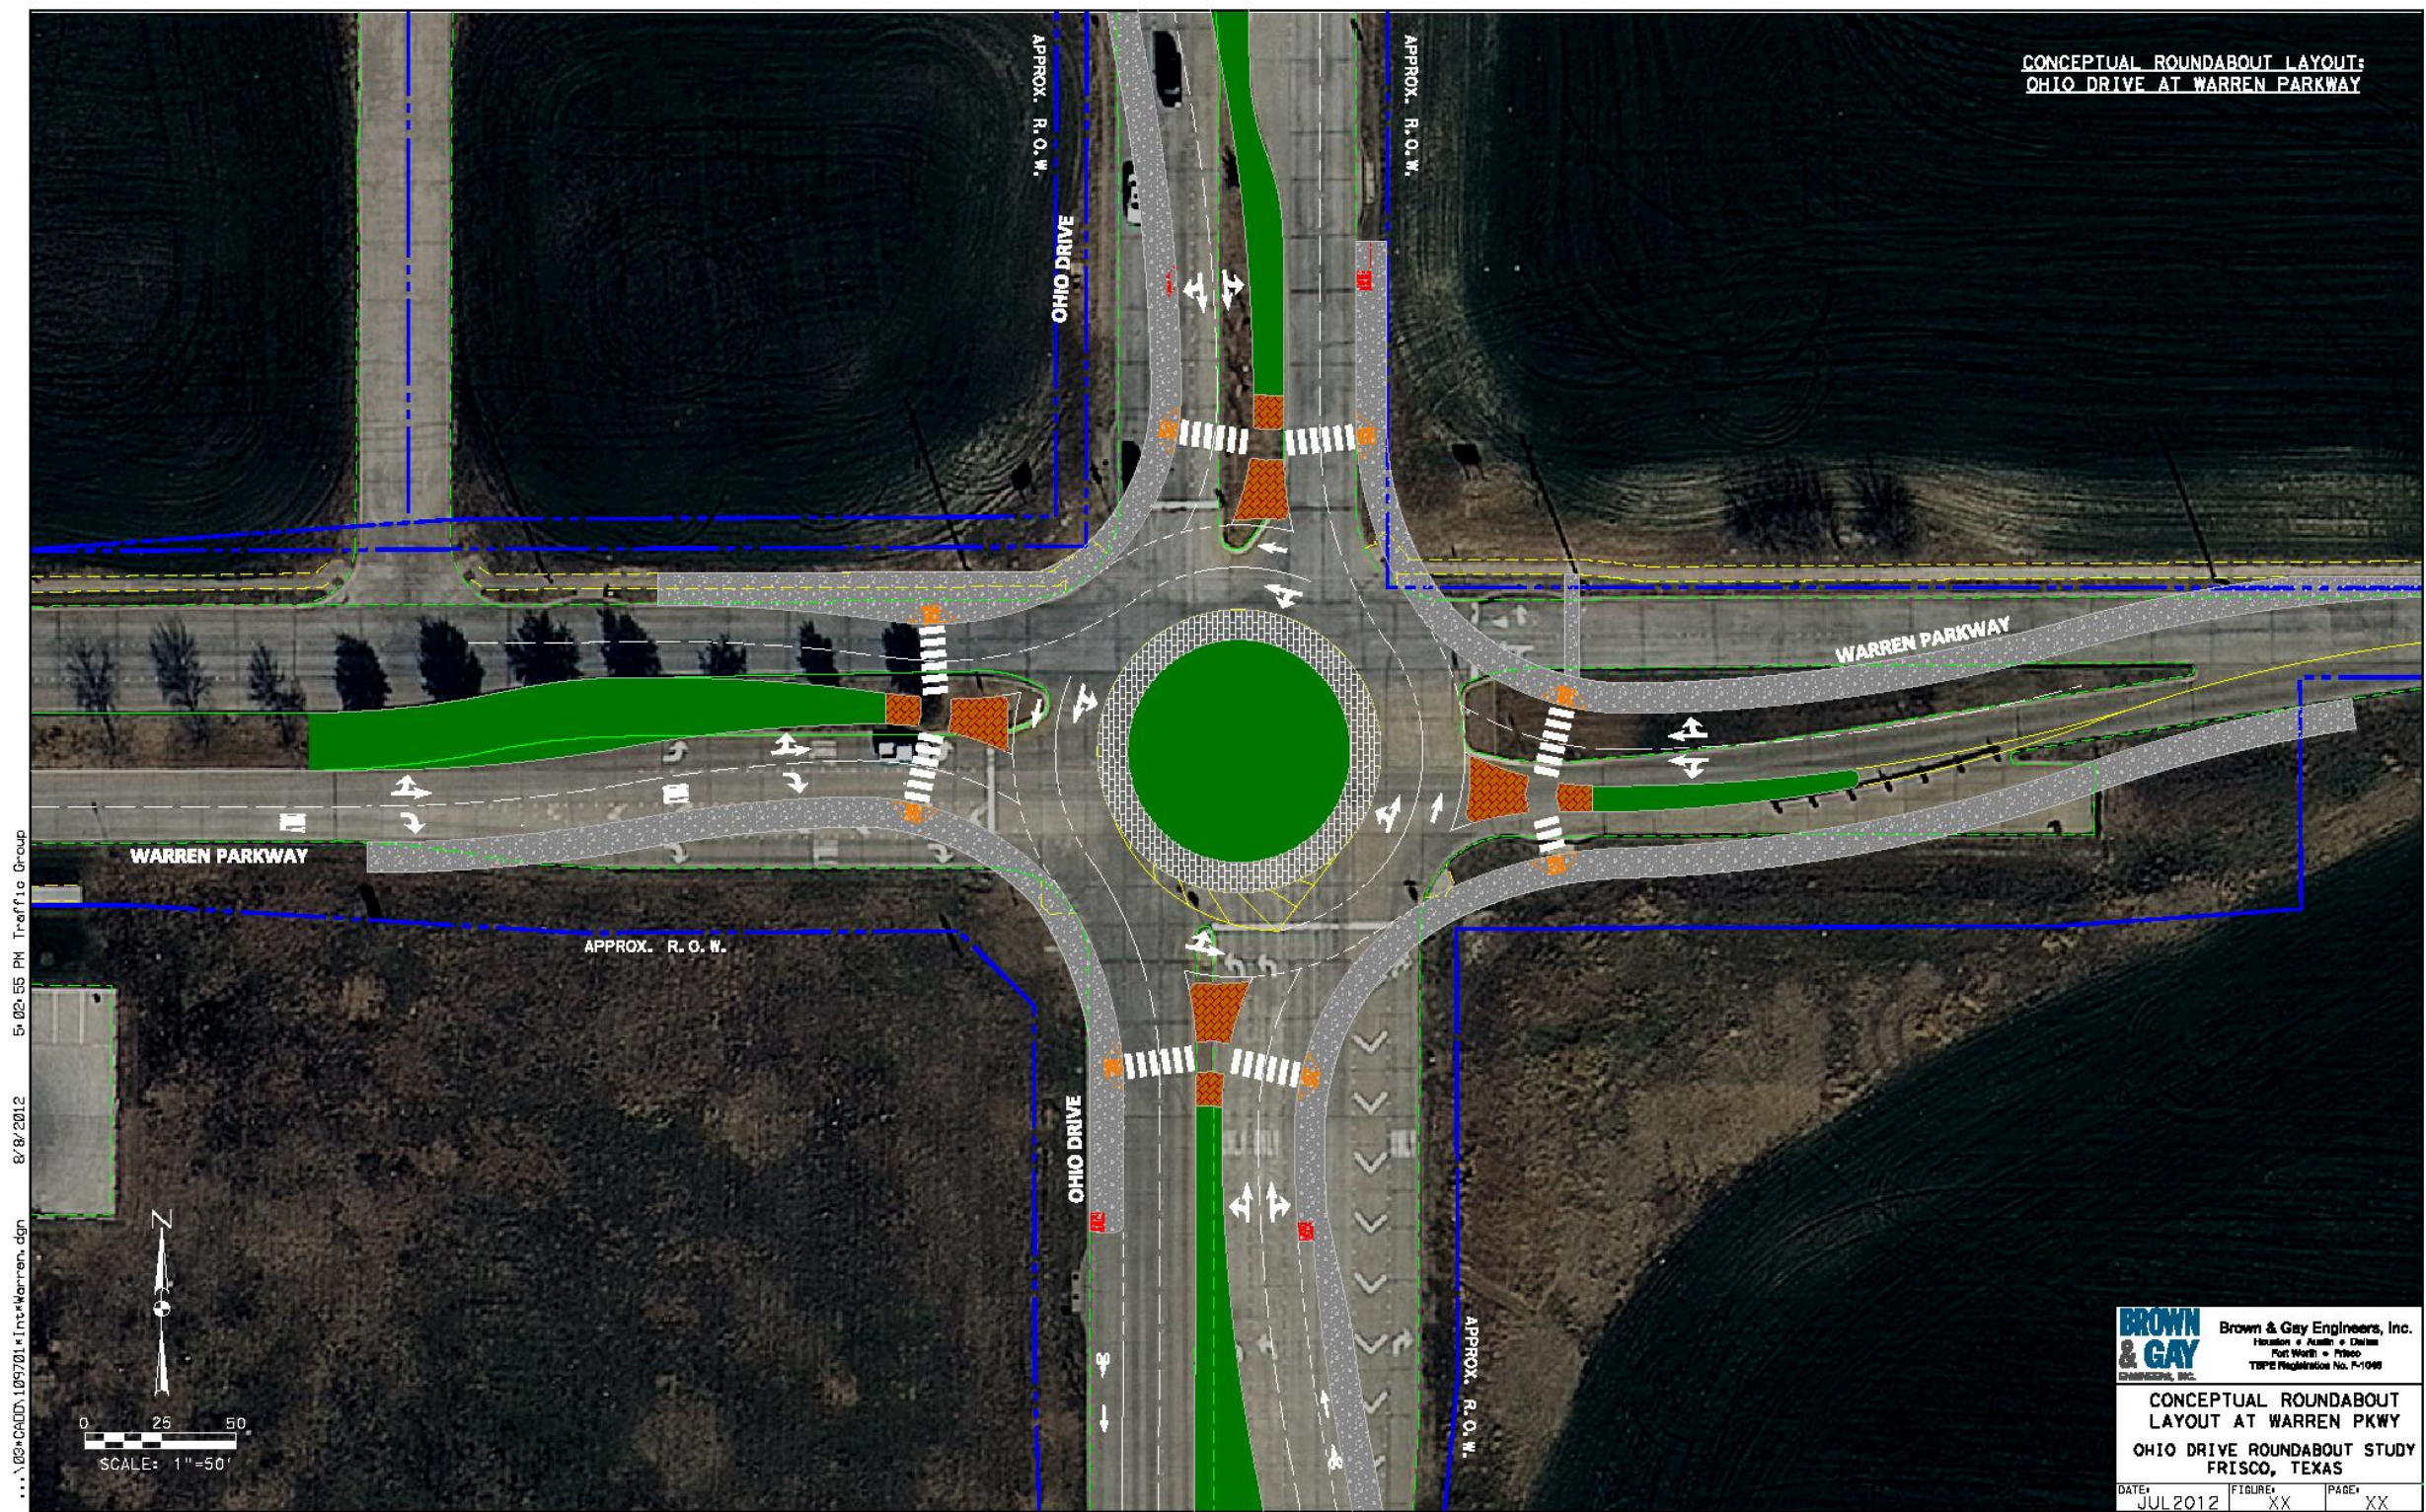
Proposed Roundabout: Ohio Drive at Warren Parkway
